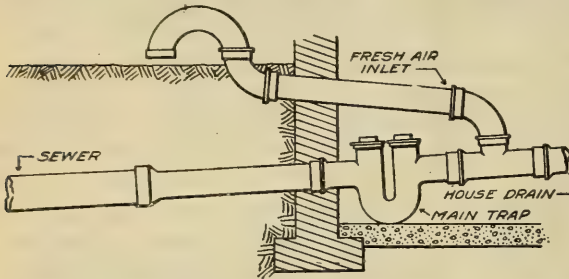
Sewer trap at house foundation, showing ventilator.
